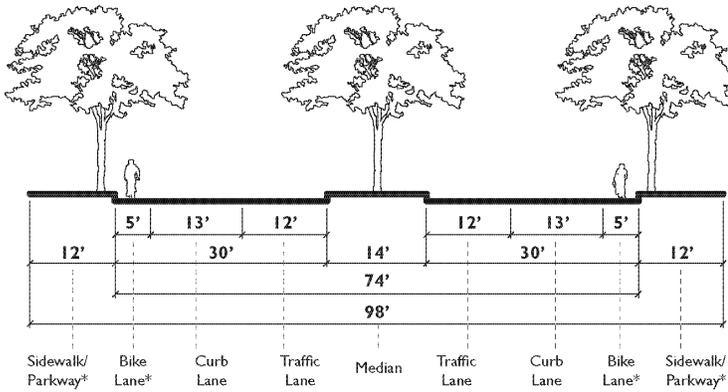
(2 of 2): CITY OF CHINO GENERAL PLAN ROADWAY CROSS-SECTIONS
